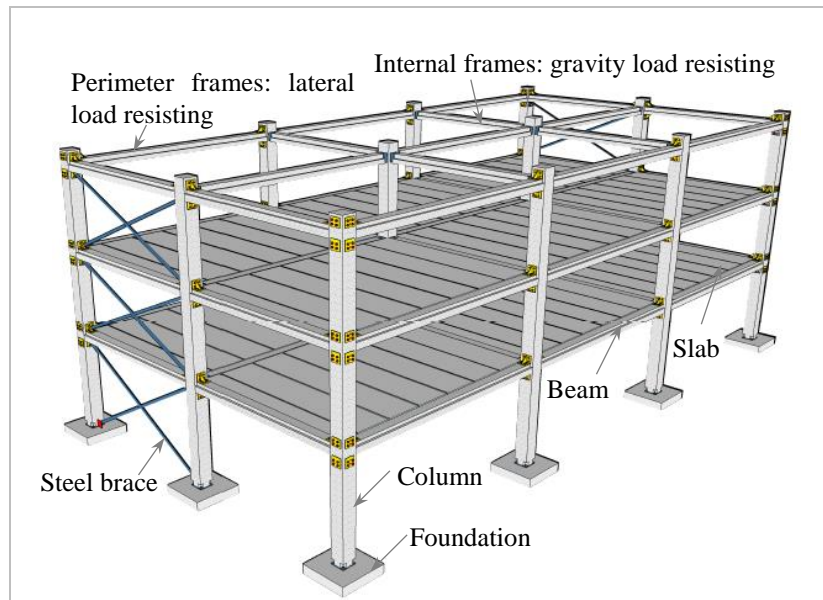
Schematic layout of the proposed demountable precast concrete frame building system
